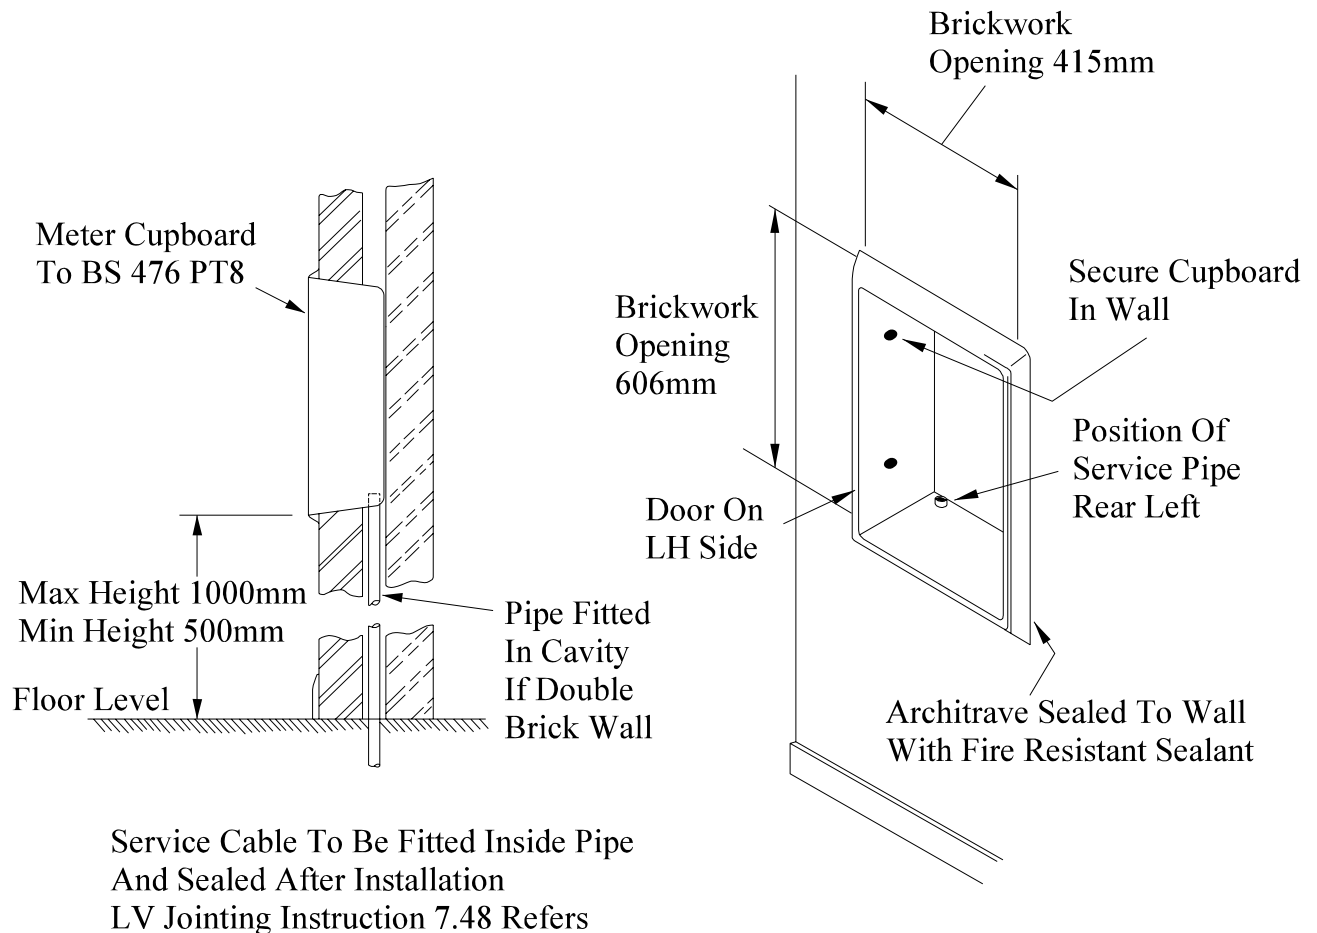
Drawing Number OG/65/4418	General Arrangement for Surface Entry Meter Cupboard
